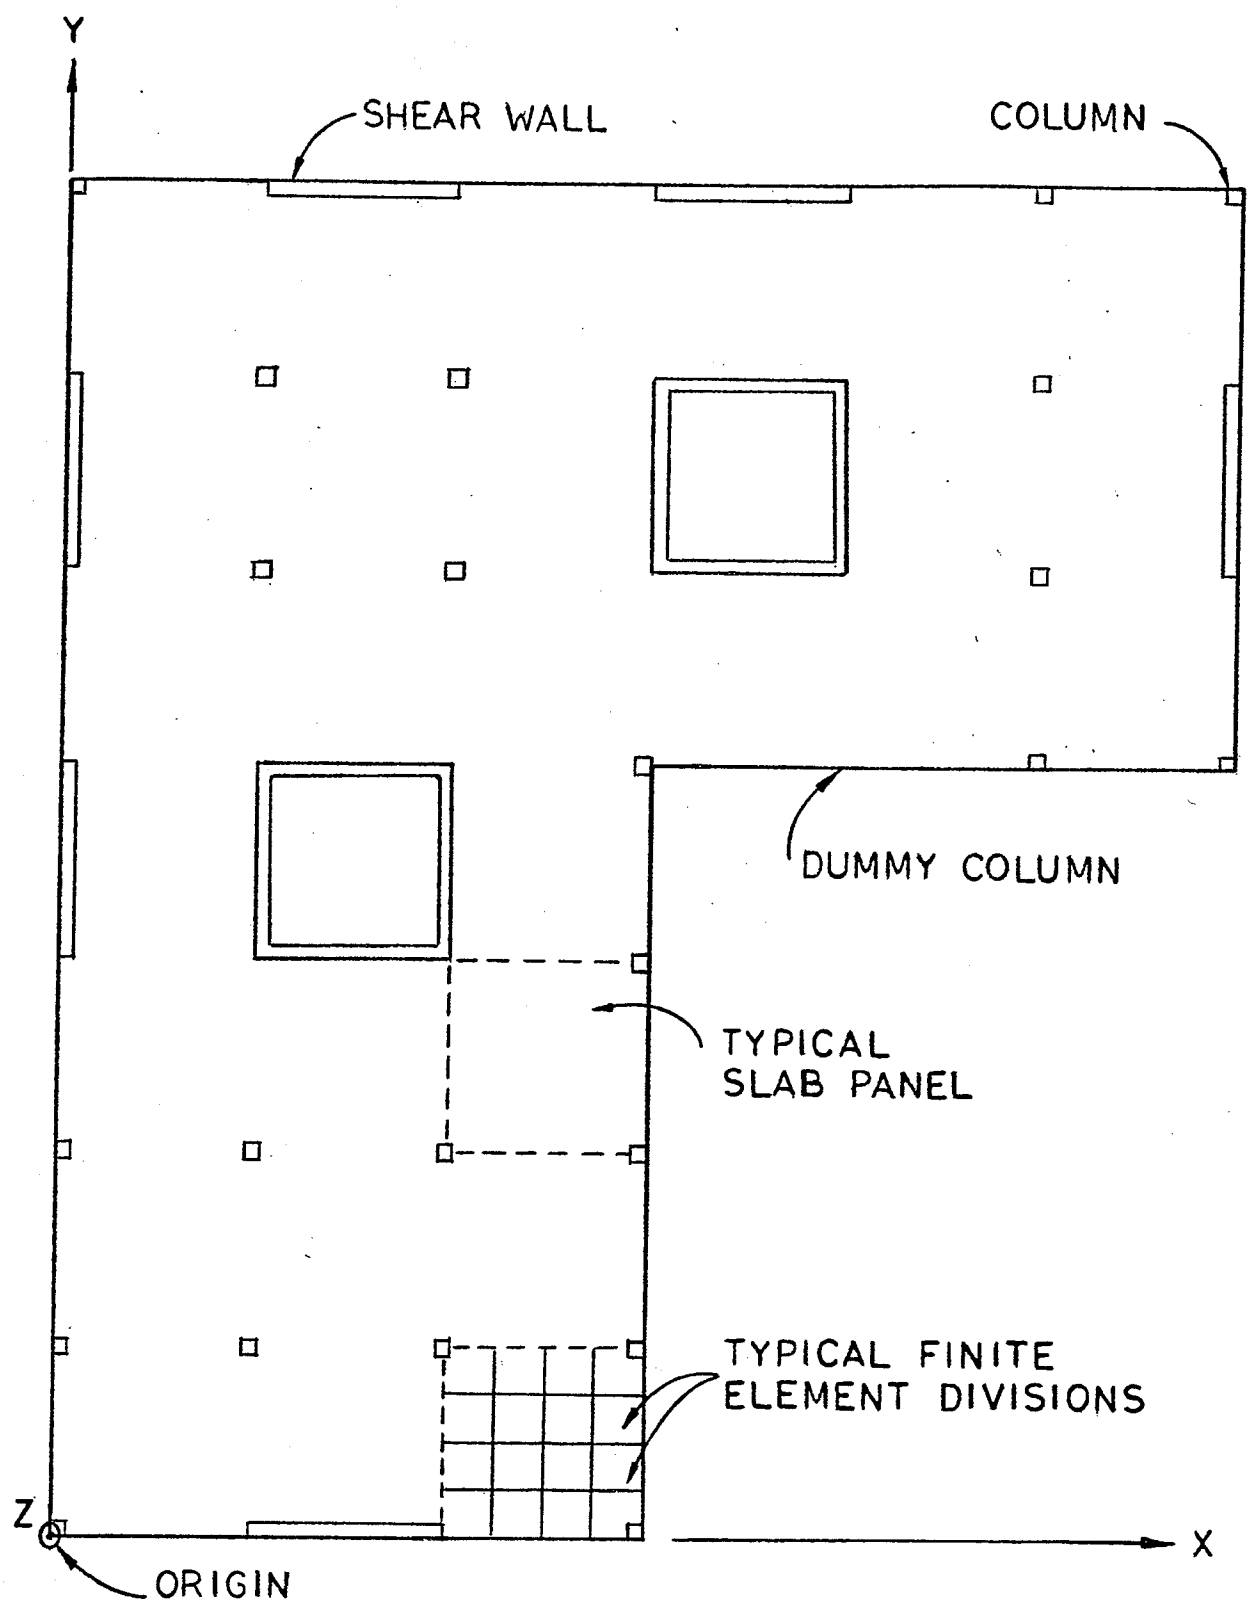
LAYOUT OF A TYPICAL FLOOR
